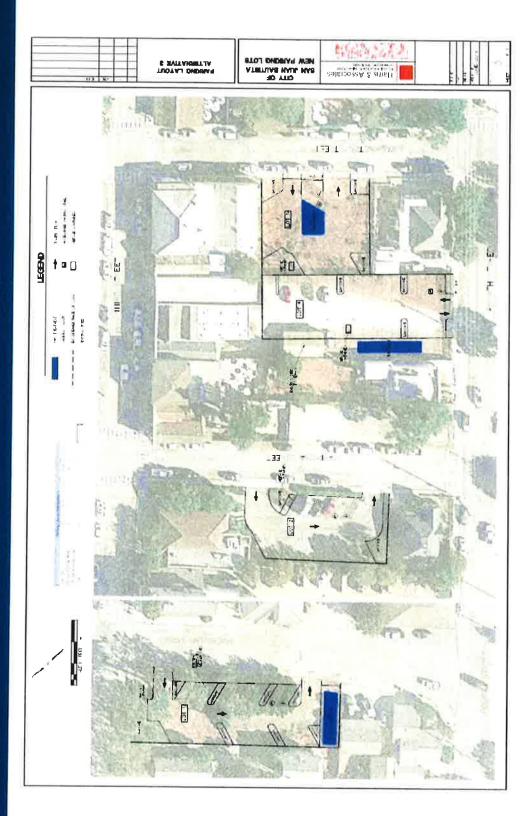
## EXHIBIT B – DOWNTOWN PARKING ALTERNATIVE #2
